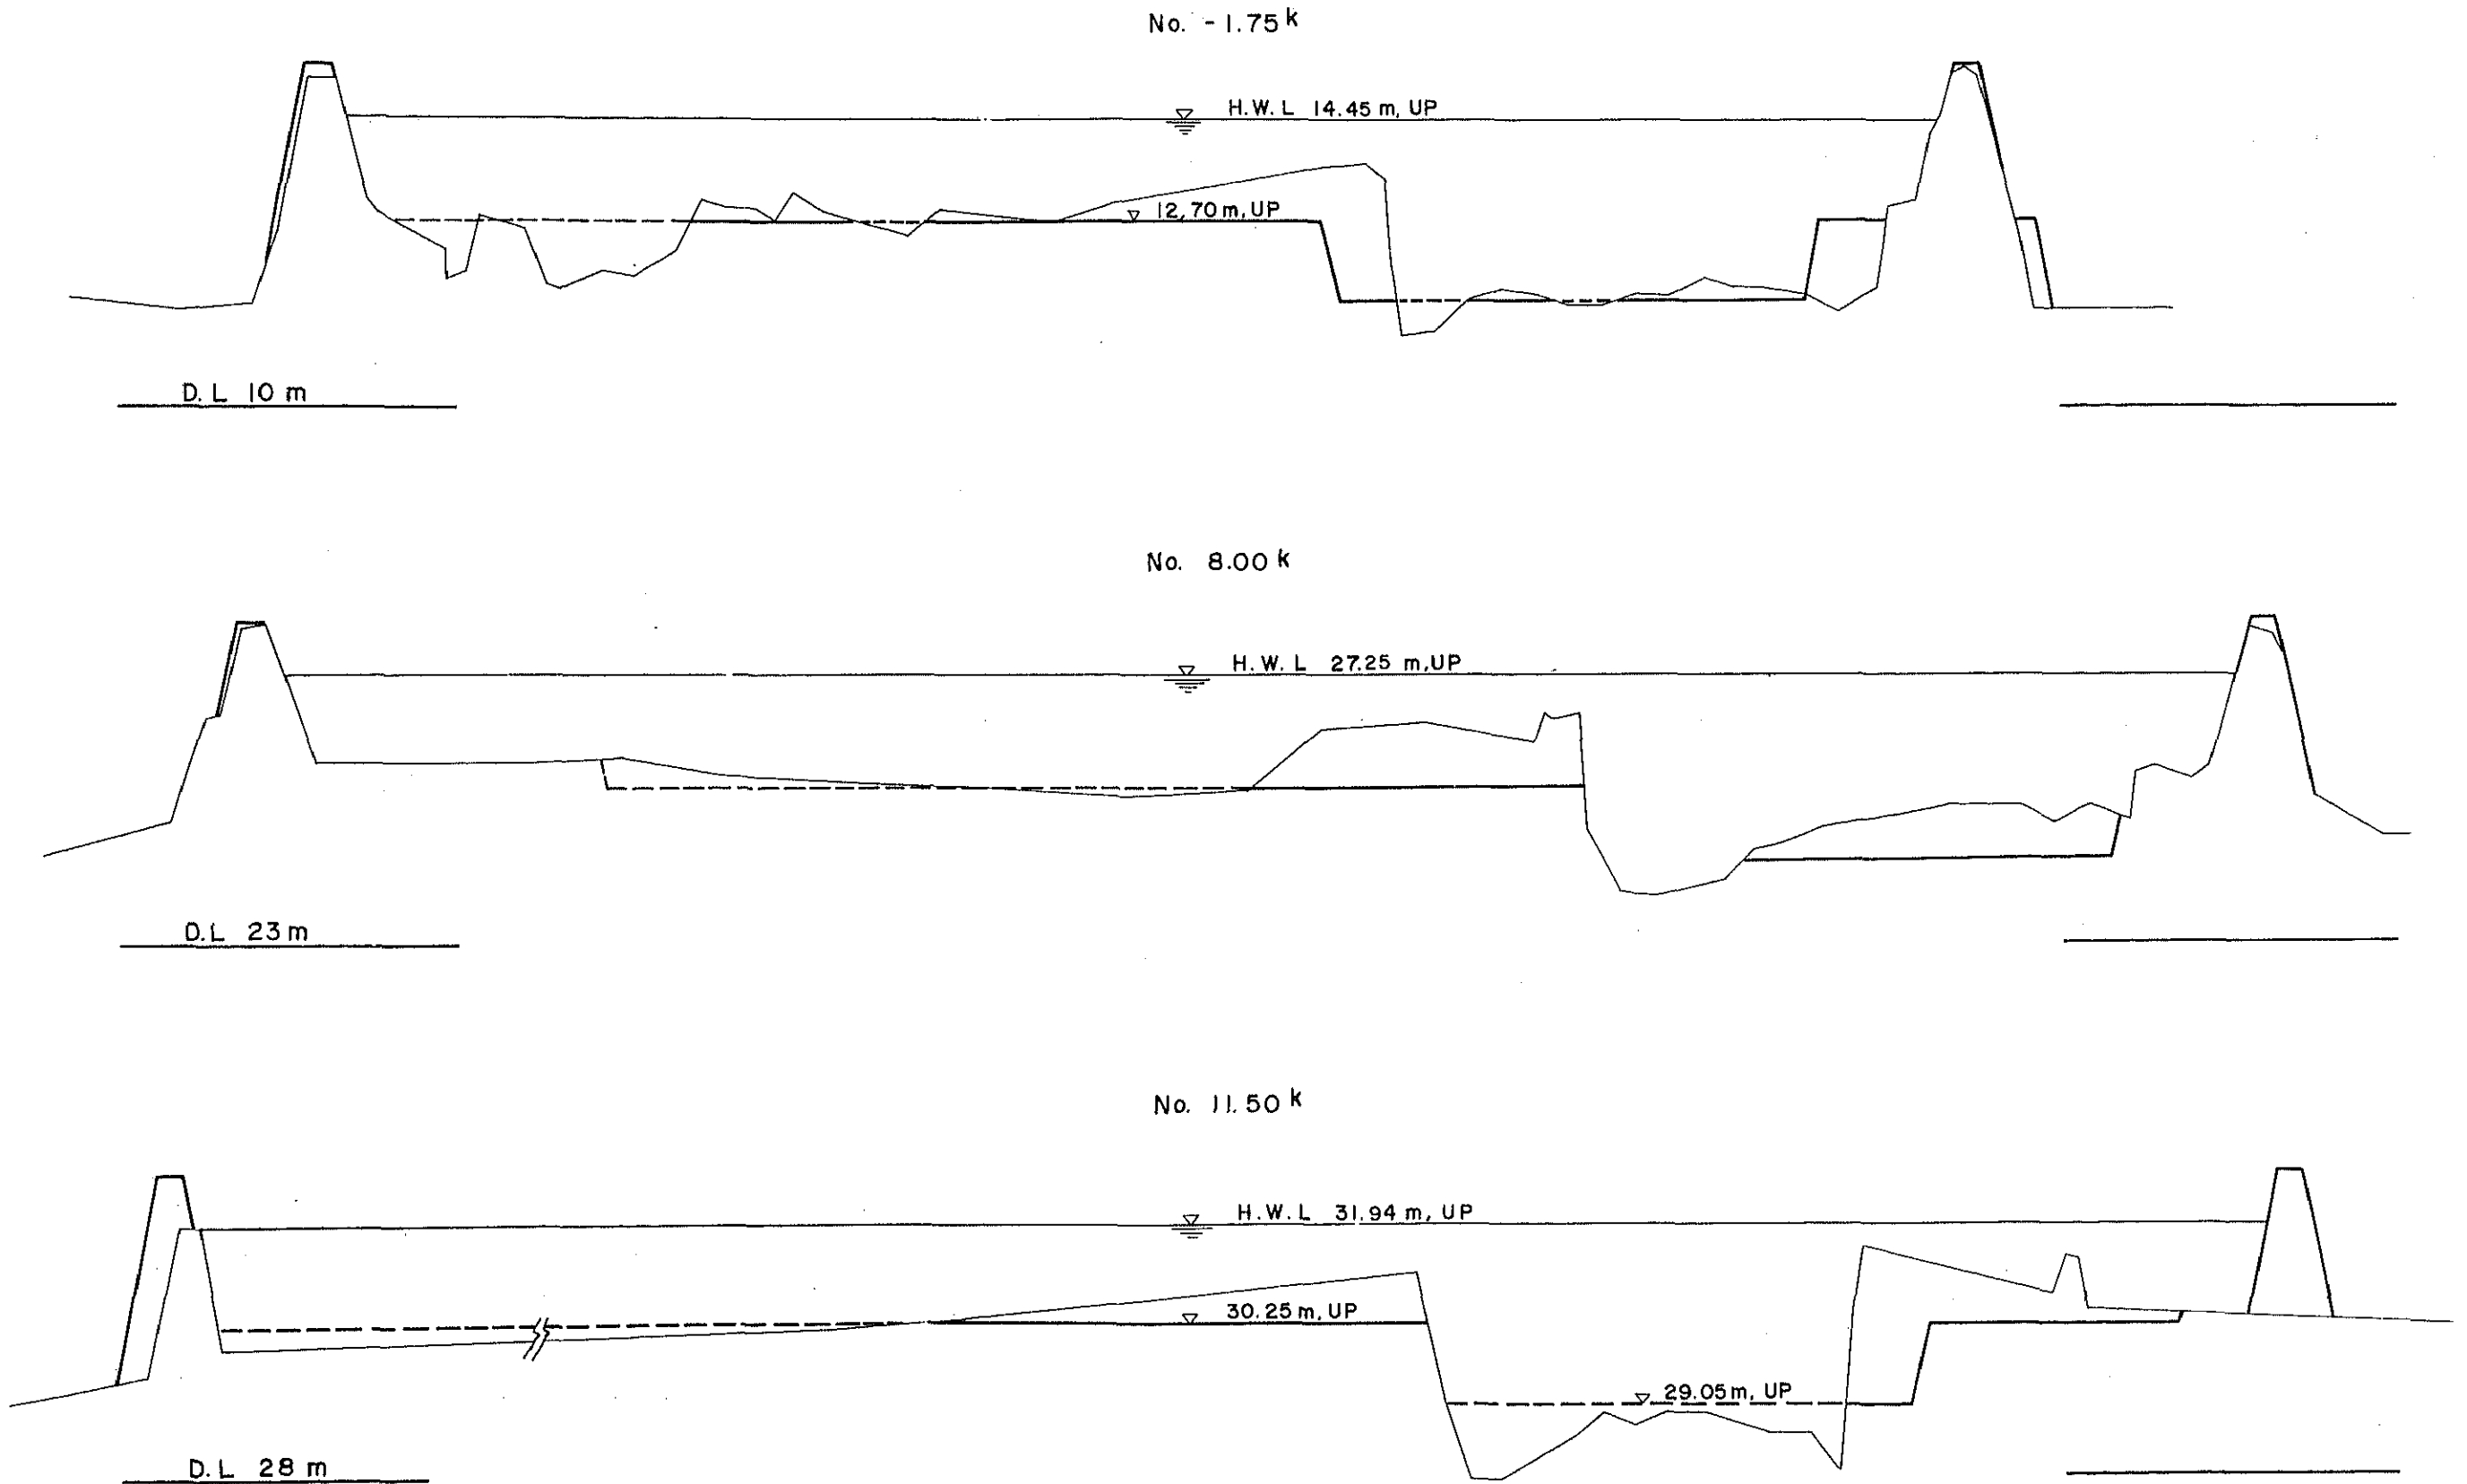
Typical Cross-Sections of Pulau Gambar Canal
